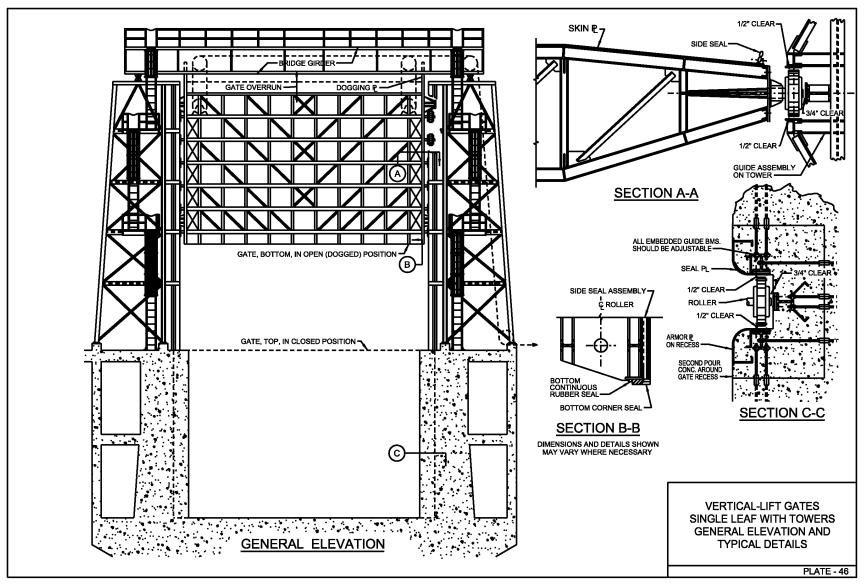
Plate 46: Vertical-lift gates, single leaf with towers, general elevation, and typical details
